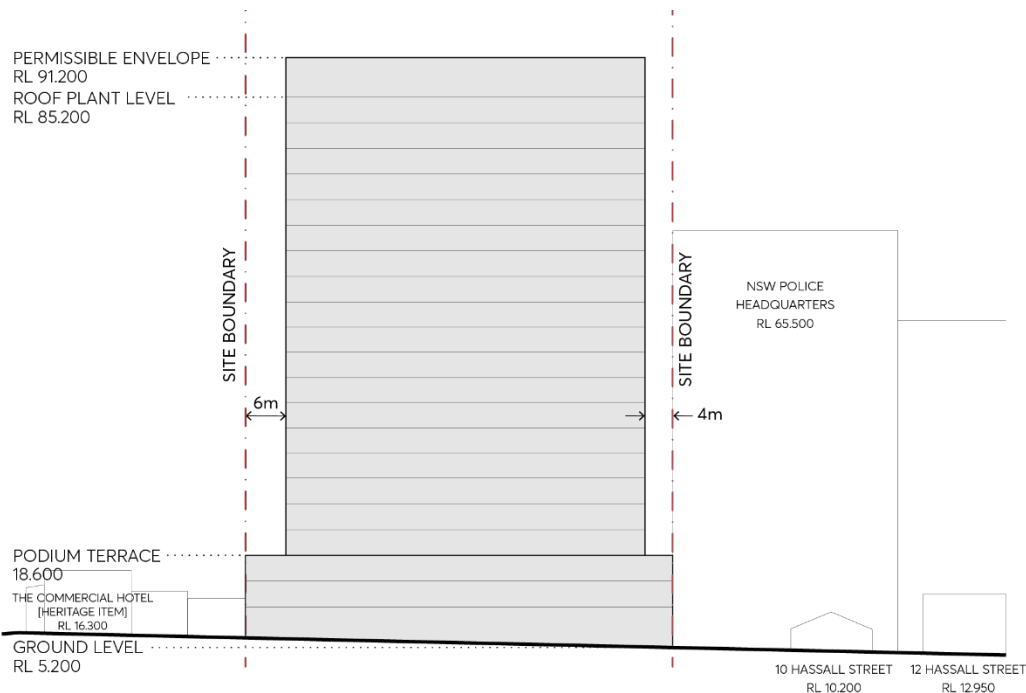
Hassall Street (southern) elevation illustrating the maximum building envelope
